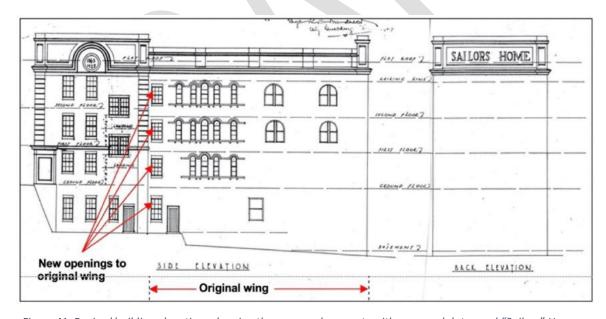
Revised building elevations showing the approved parapets with proposed dates and "Sailors" Home detail. The "Side Elevation" also shows the proposed new openings at the western end of the original wing.
